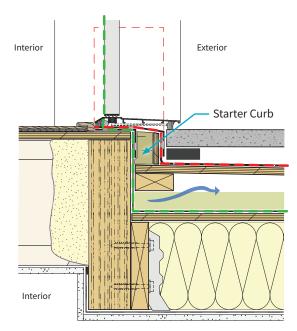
Top-side vented roof deck (flat roof FR-5) with a continuous exterior air barrier from the deck membrane through the sill membrane behind the starter curb, through sealant to the door assembly (green dashed line).
